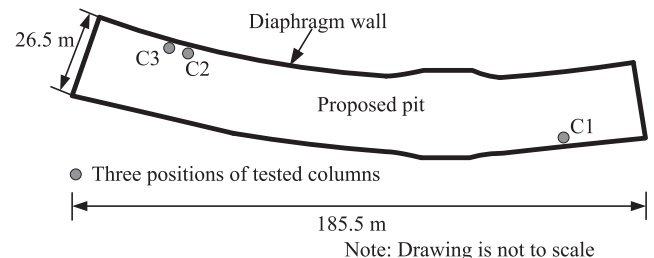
Layout of three positions of test columns in Case D (data from Shen et al. 2009b)
